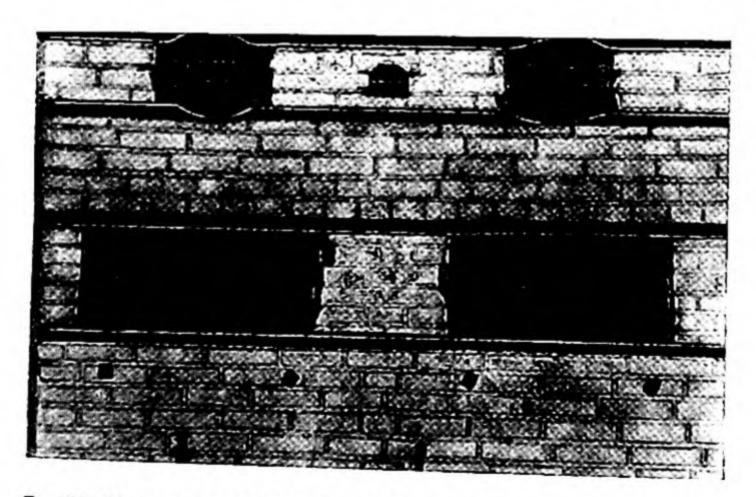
Channels embedded in wall for mounting current transformers and a bushing in switchgear room
